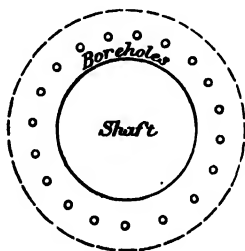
Arrangement of Bore-holes for Freezing Process
